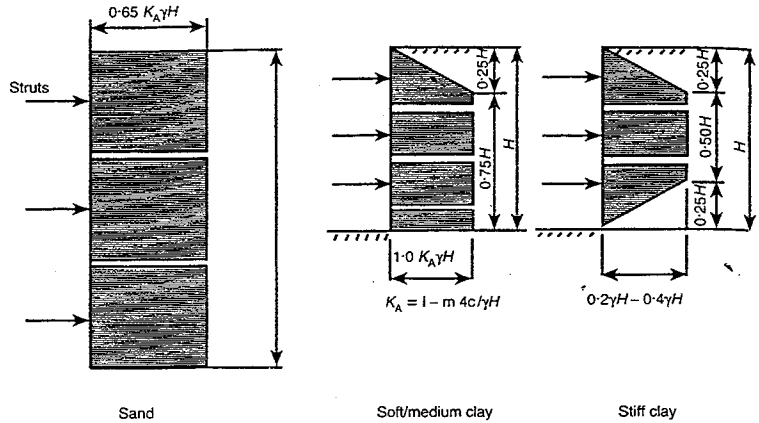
Active pressure diagrams relating to maximum strut loads in braced earth retaining structures (Source: Terzaghi, Soil mechanics in engineering practice, 2nd ed., 1967. Reprinted by permission of Wiley, New York)
